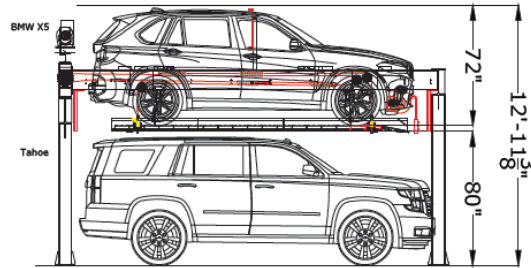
Exhibit B | Parking Facilities and Public Shared Parking – Parking System Details
